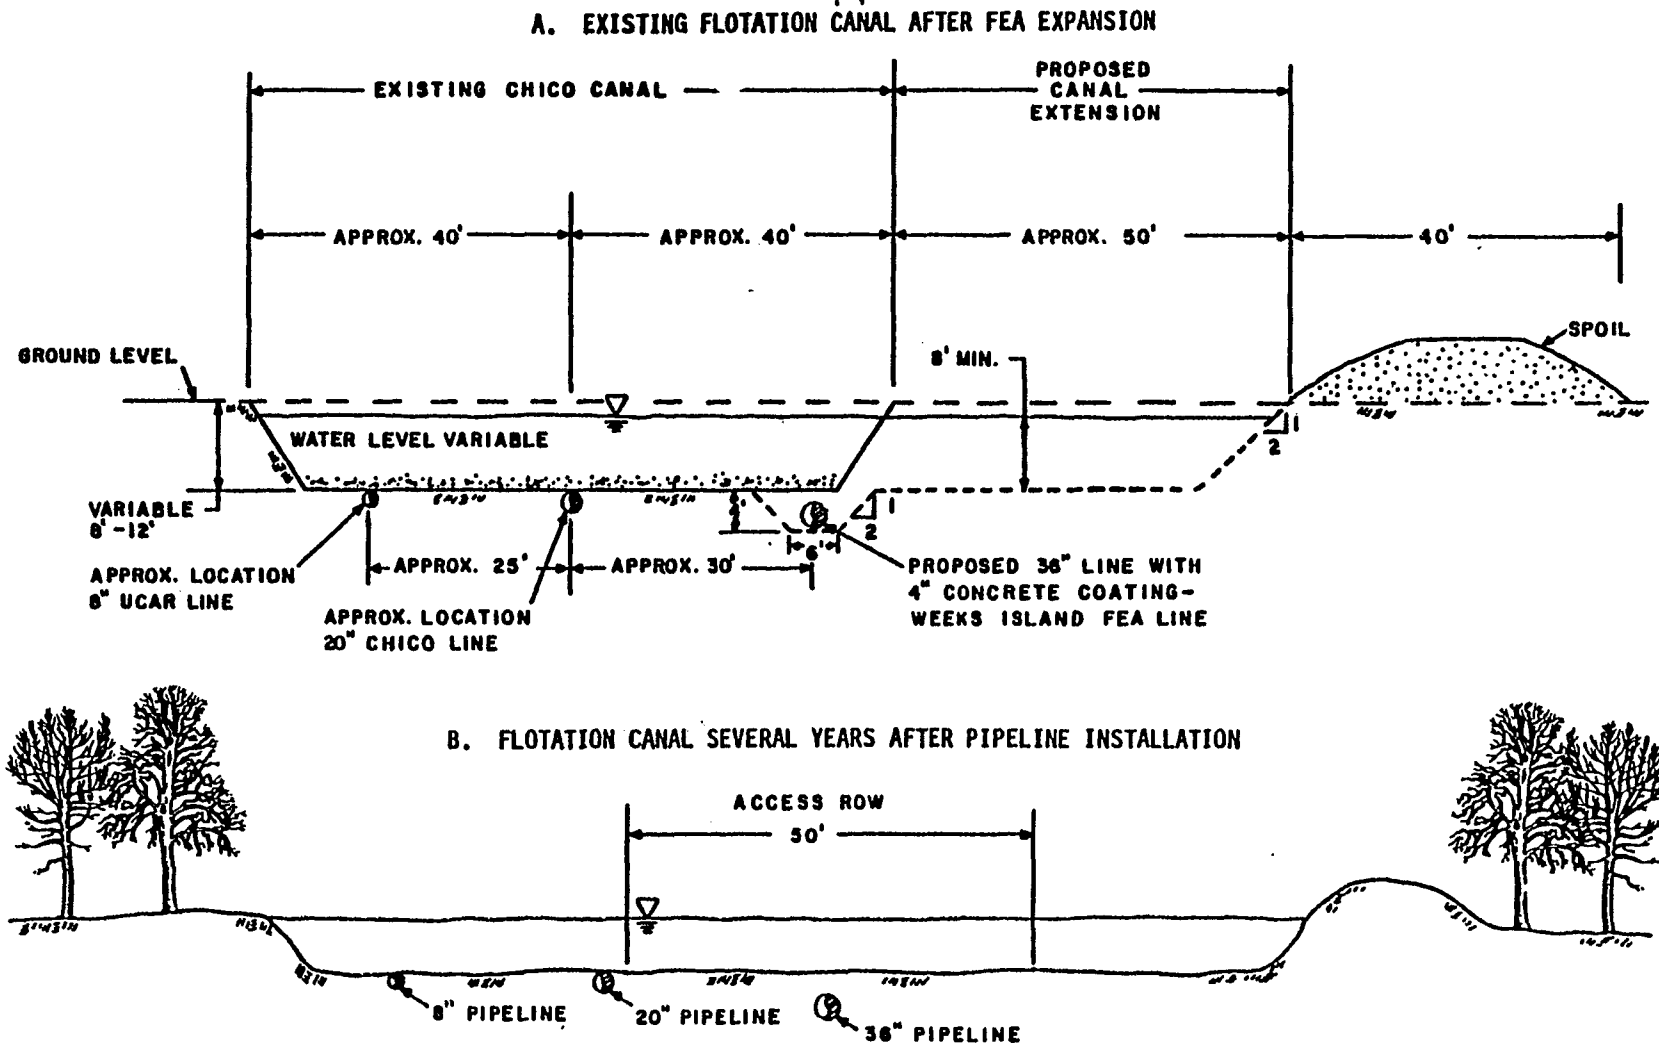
Typical Cross-Section of Conventional Flotation Canal Expansion of Existing Canal After Excavation and Several Years After Pipeline Installation.
